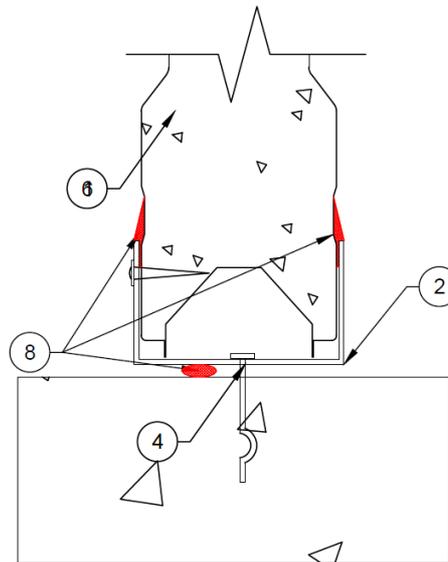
Bottom Detail for Horizontal Speedpanel Wall
